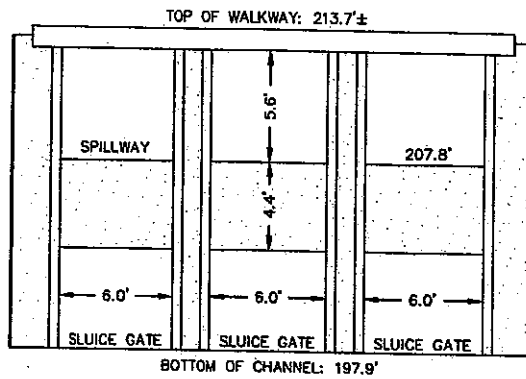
Available surveyed detail of Commerce Center dam, looking downstream. Note that the "spillway" elevation may vary across the dam, and may need additional measurements if work is proposed for this dam.
